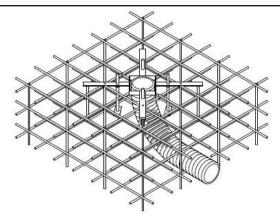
Three-dimensional scheme of concrete foundation reinforcement
